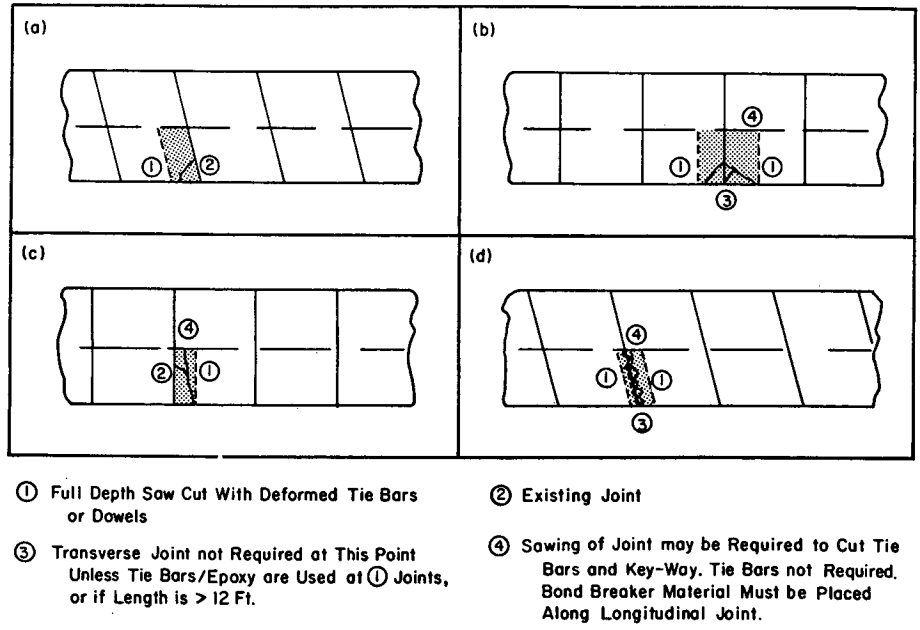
Full-depth repair recommendations for plain jointed concrete pavements under heavy traffic.
